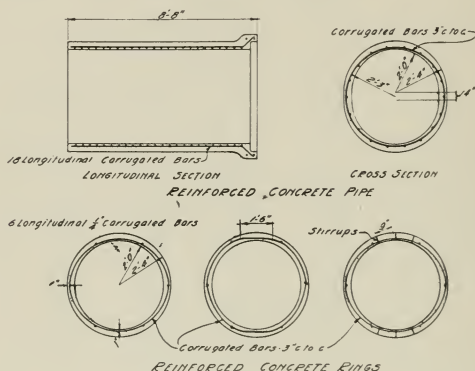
DISPOSITION OF REINFORCEMENT IN THE REINFORCED CONCRETE PIPE AND RINGS.
